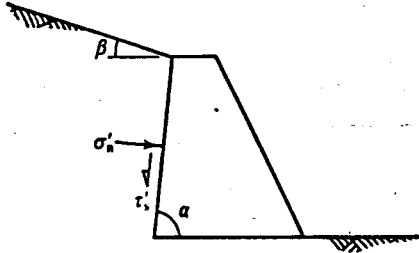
Earth pressures on a rough wall with a sloping face and with sloping ground.
